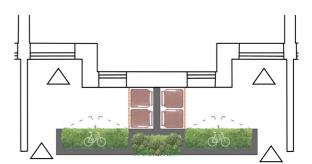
Stonetown Terrace Townhouses - Entrance Plan Diagram
